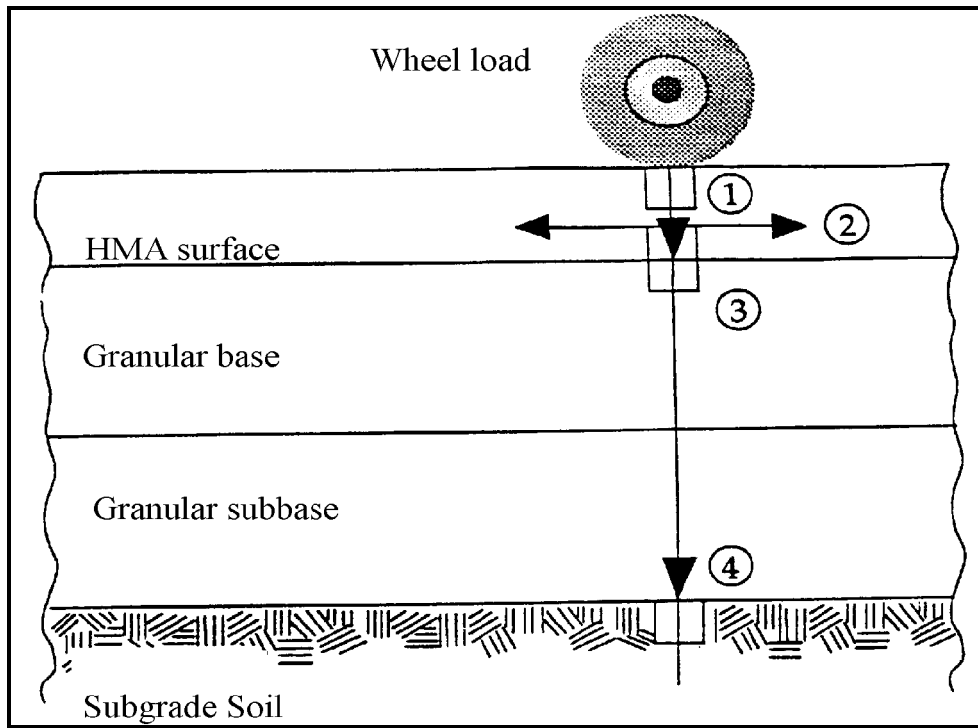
Critical stress / strain locations in asphalt concrete pavement with granular base.
